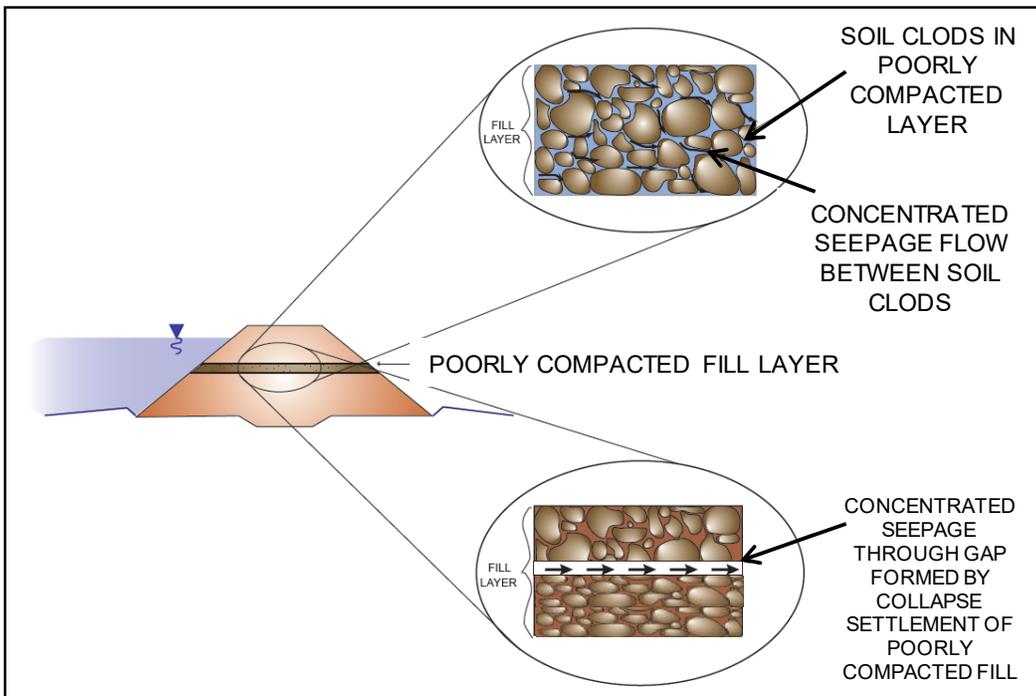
C-10.—Crack, hydraulic fracture, or openings in poorly compacted and/or segregated layers (courtesy of Mark Foster).
